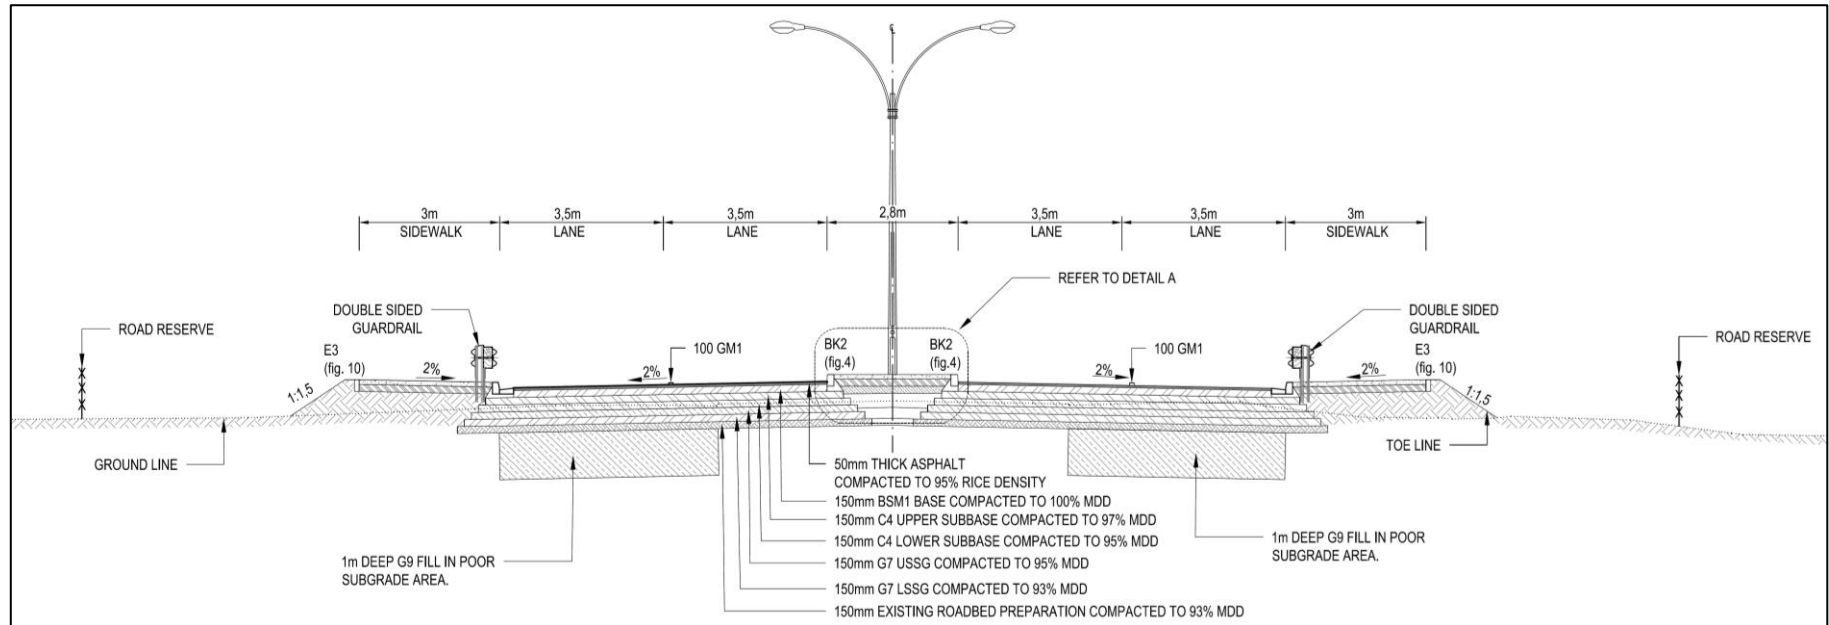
Typical Cross-section from km 0.0 to km 6.0
